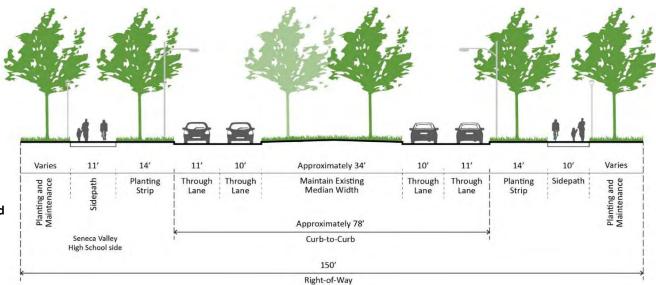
Proposed Great Seneca Highway Street Section (north of the railroad tracks)
